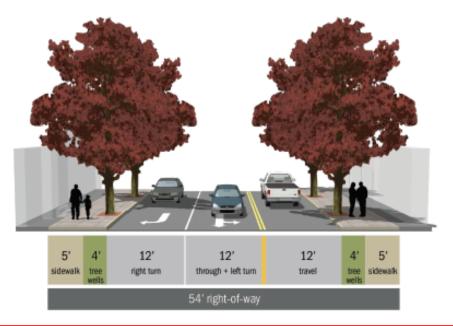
Figure X. Conceptual Cross-Section for Ochoco Street - West of Main Street within existing right-of-way (looking east)
